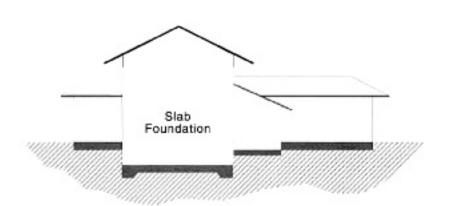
Slab foundations. If your house was built on a concrete slab, it is probably bolted to its foundation.
